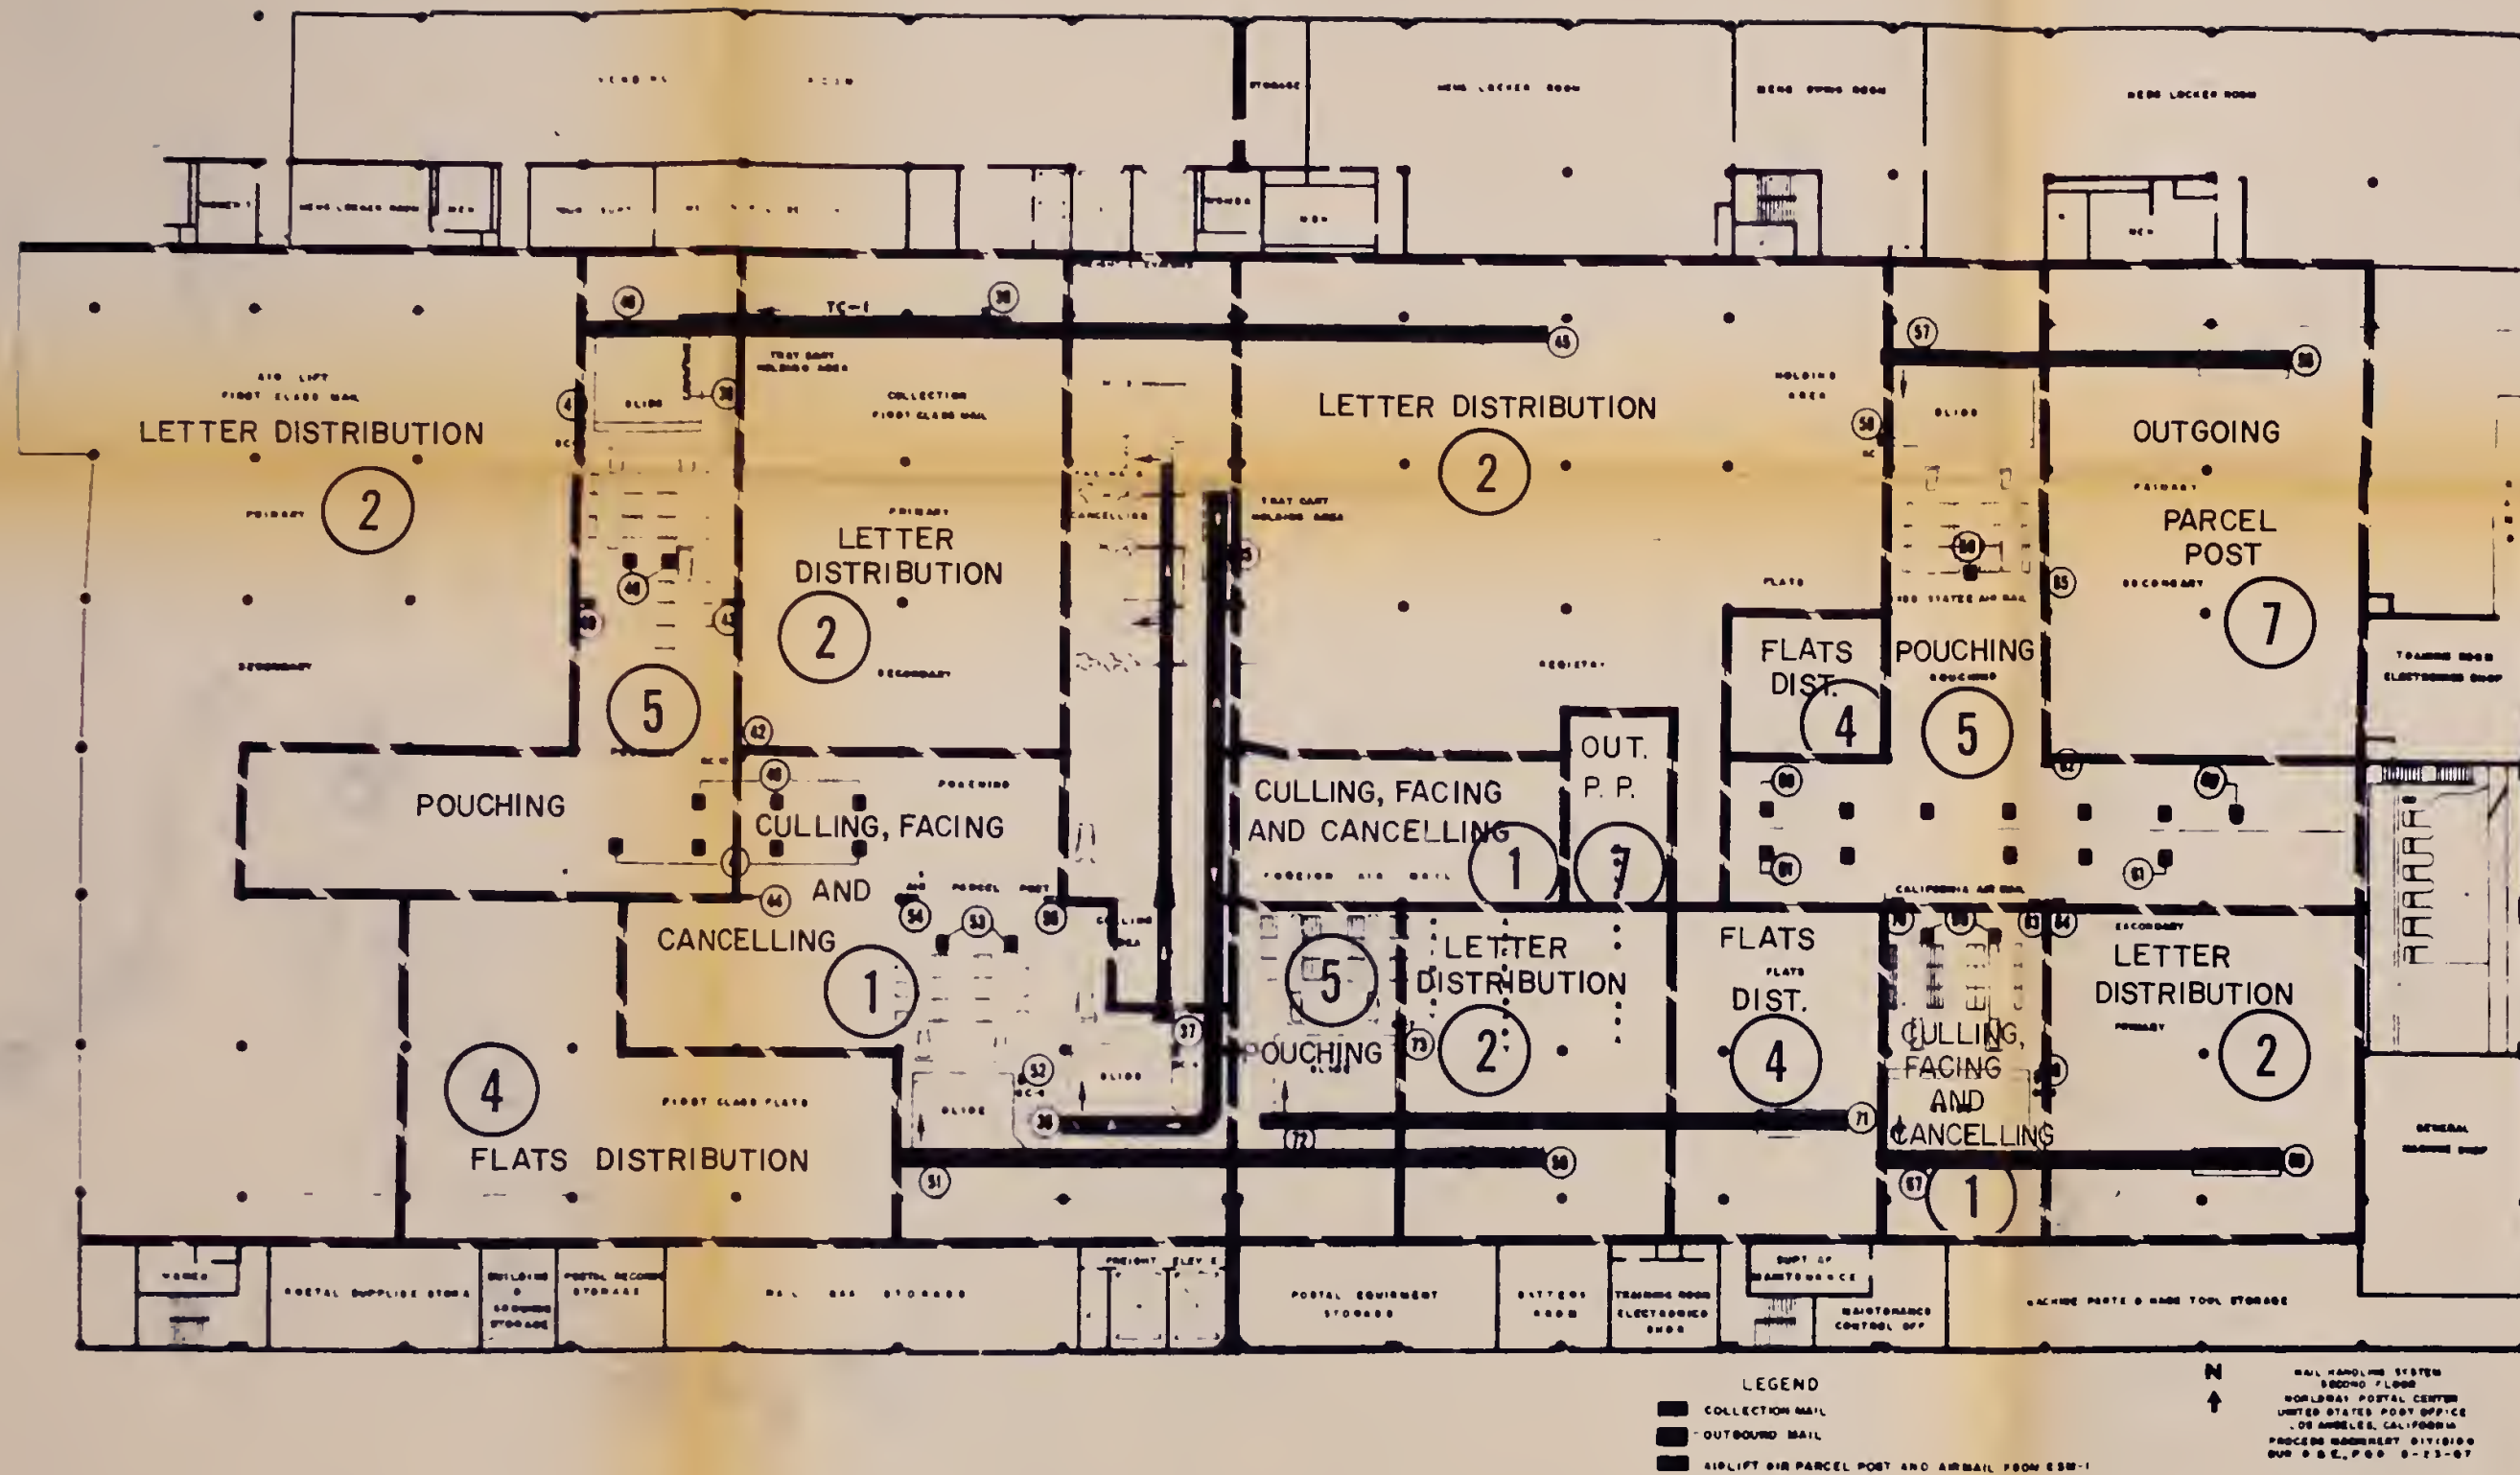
LOS ANGELES POST OFFICE SECOND-FLOOR PLAN SHOWING DESIGNATED WORK AREAS
